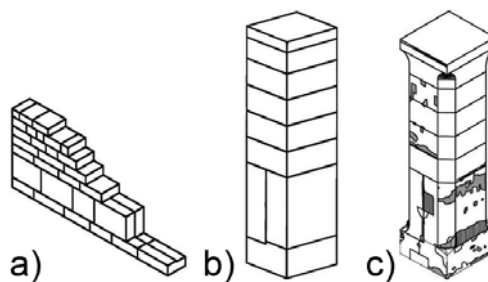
Scheme of the pillar assemblage of the Syracuse Cathedral: (a) original wall, (b) original shape of the pillars and (c) shape after 1924-26 intervention.
